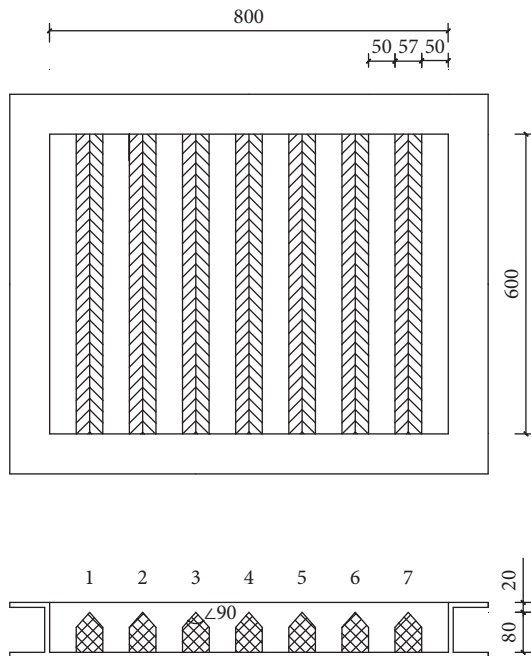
Forming mold of anti-dry-shrinkage cracking performance test specimens (mm).
